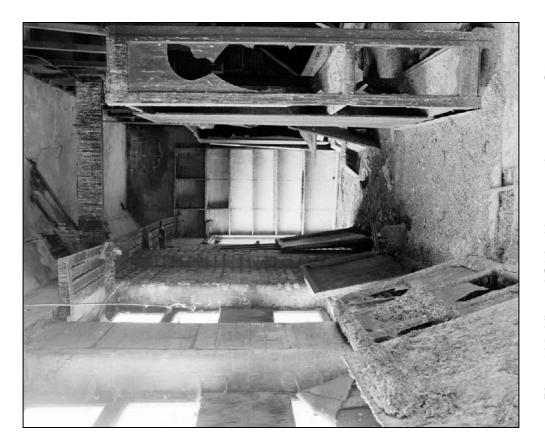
View of S2 looking towards entrance, S1 to right – note timber glazed display units of S1 (film 37.2)
